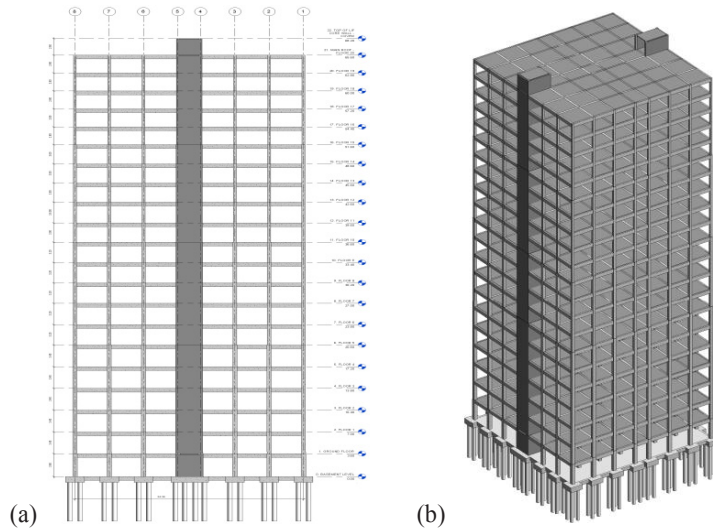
(a) 2D North Elevation of the BIM model; (b) 3D Solid BIM.
